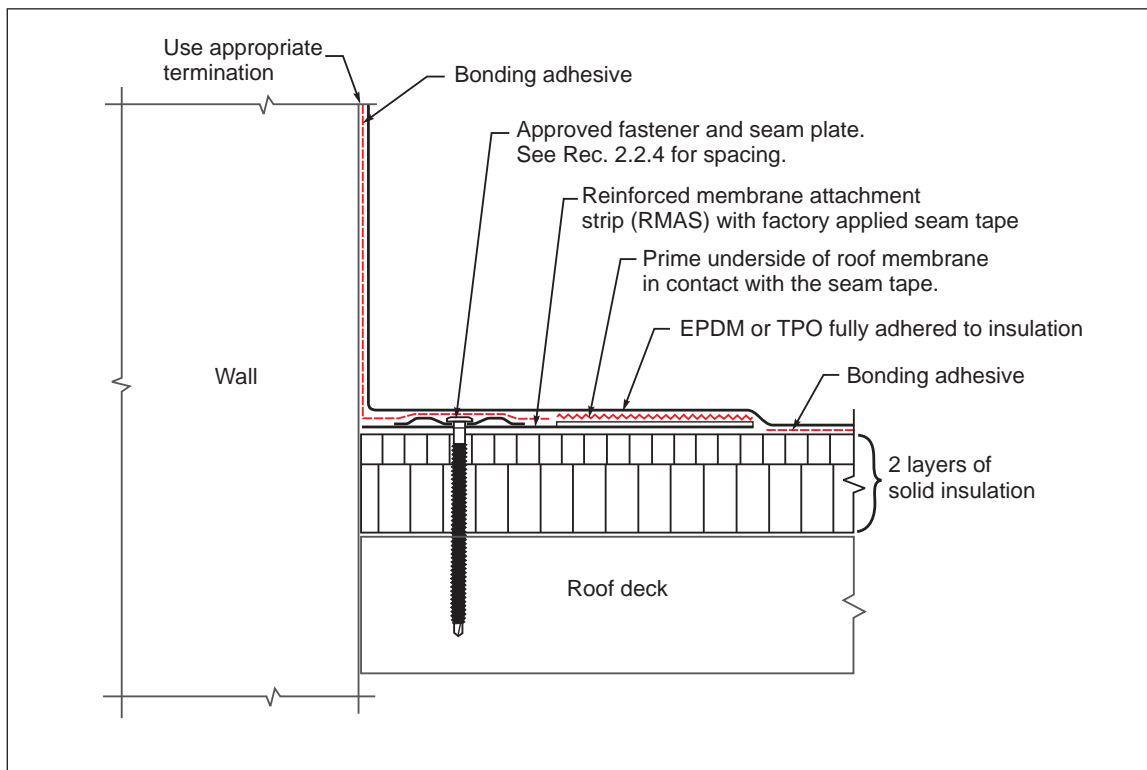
Reinforced membrane attachment strip secured to roof deck
